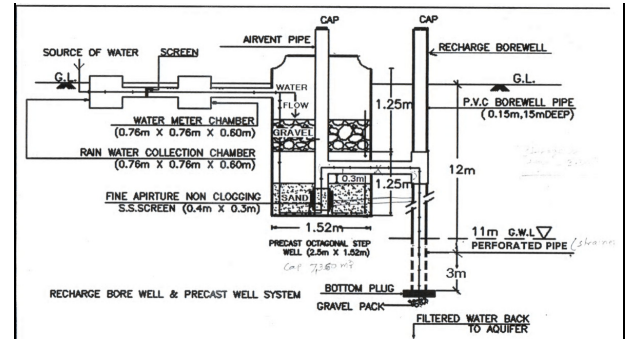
Sectional View of Pilot Recharge System From the Terrace of Structural Lab (A.M.D., S.V.N.I.T., Surat)
